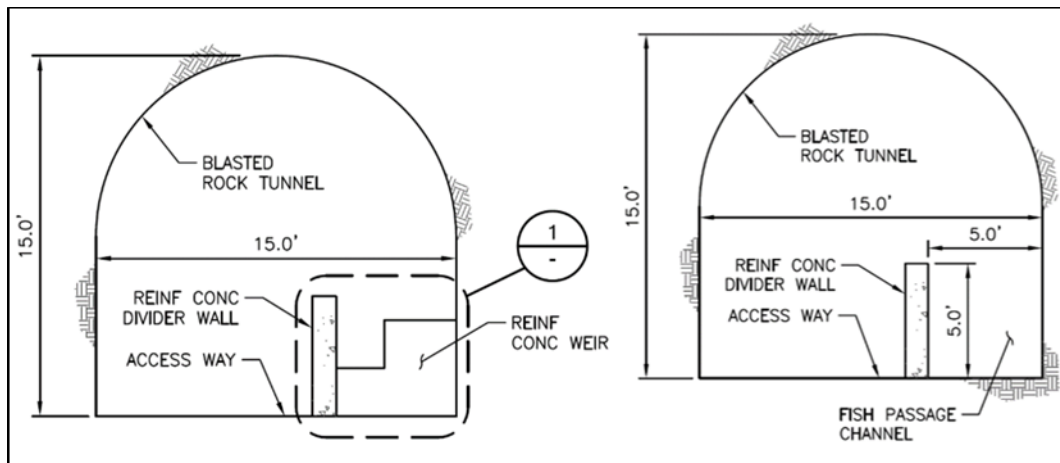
Tunnel and Fishway Typical Sections (Source: McMillen Jacobs 2018)
